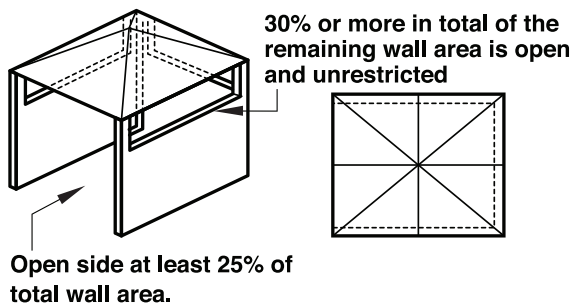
Outdoor Area Example 5. With the open side at least 25% of the total wall area and 30% or more in total of the remaining wall area is open and unrestricted.
